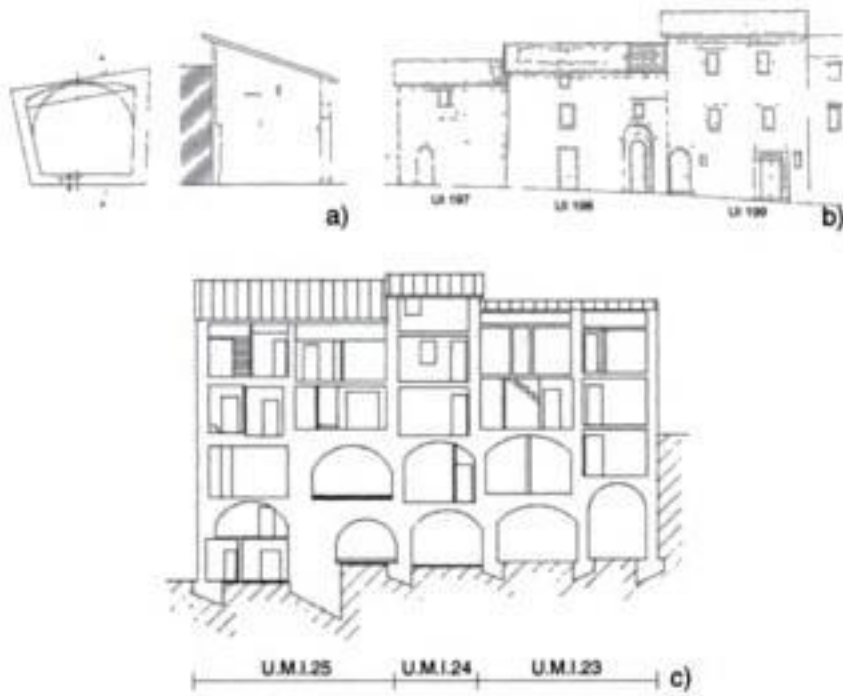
Example of: (a) simple isolated building; (b) row building; (c) complex building.
